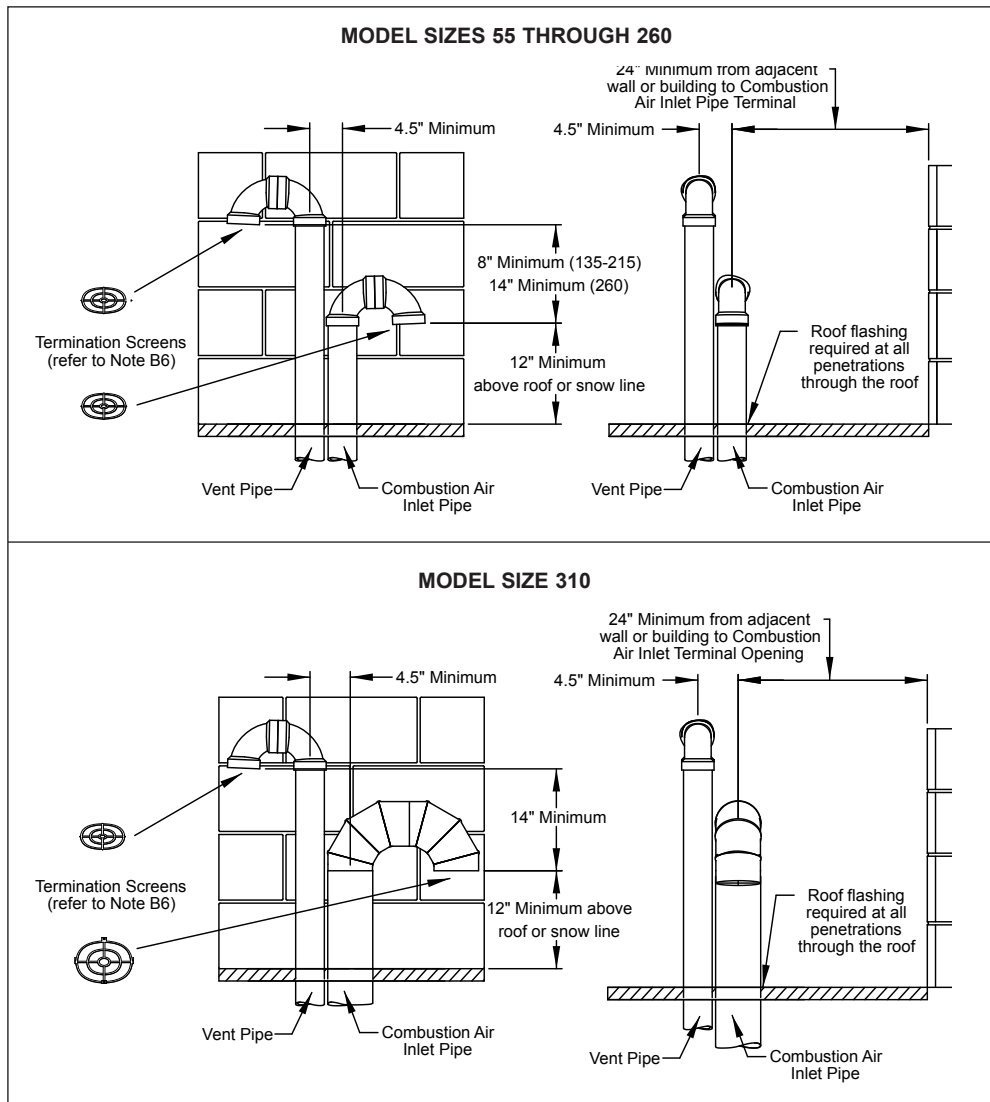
Vertical 2-Pipe Vent System for Sloped Roofs
